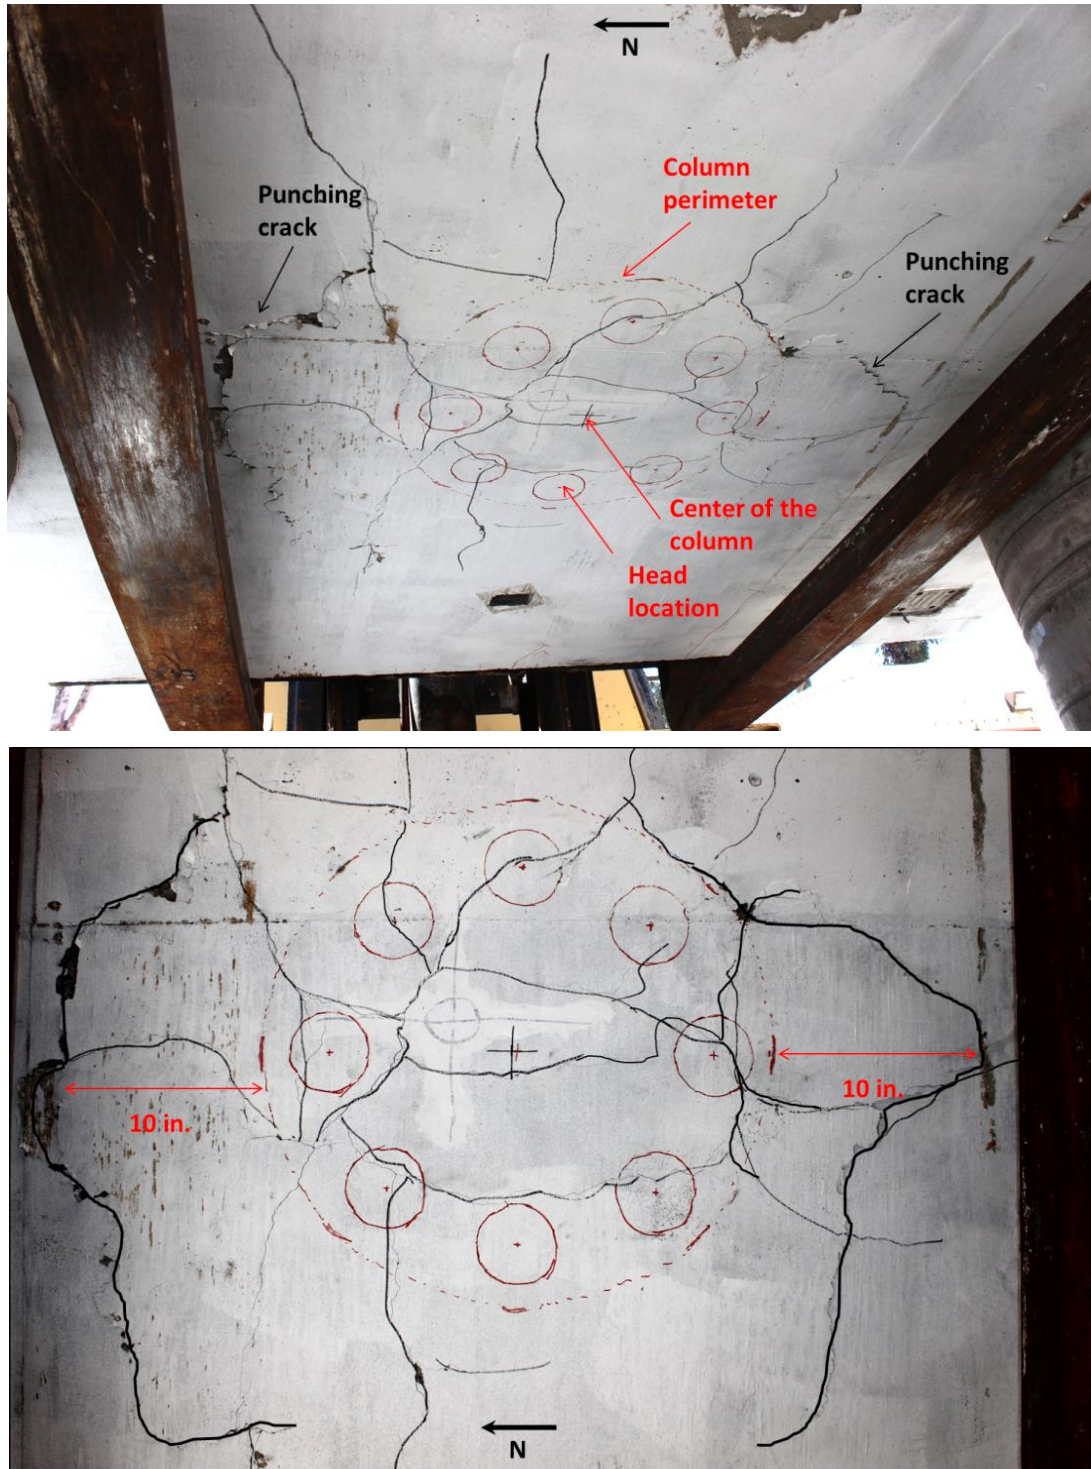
Crack pattern at the top face of the slab (bottom face in the specimen) after the testing of Specimen #1
